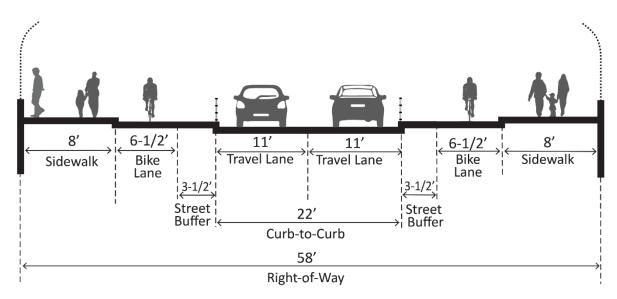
16th Street (M-9): Colesville Road to East-West Highway, Looking North
